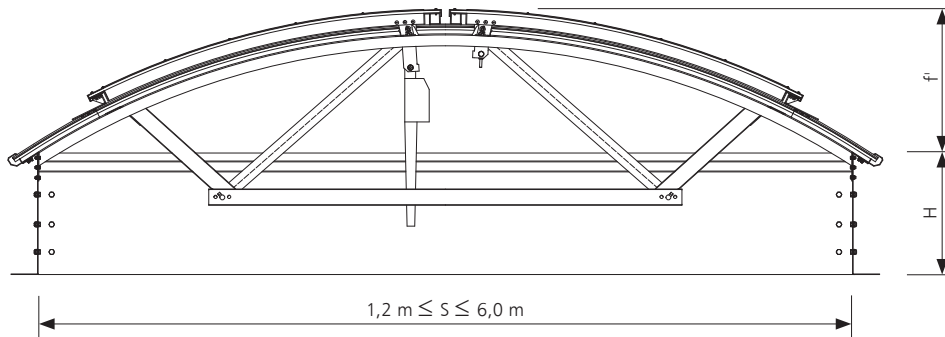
Cross section D-D of mcr PROLIGHT arch shaped continuous rooflight with integrated smoke exhaust and daily ventilation double-leaf vent
